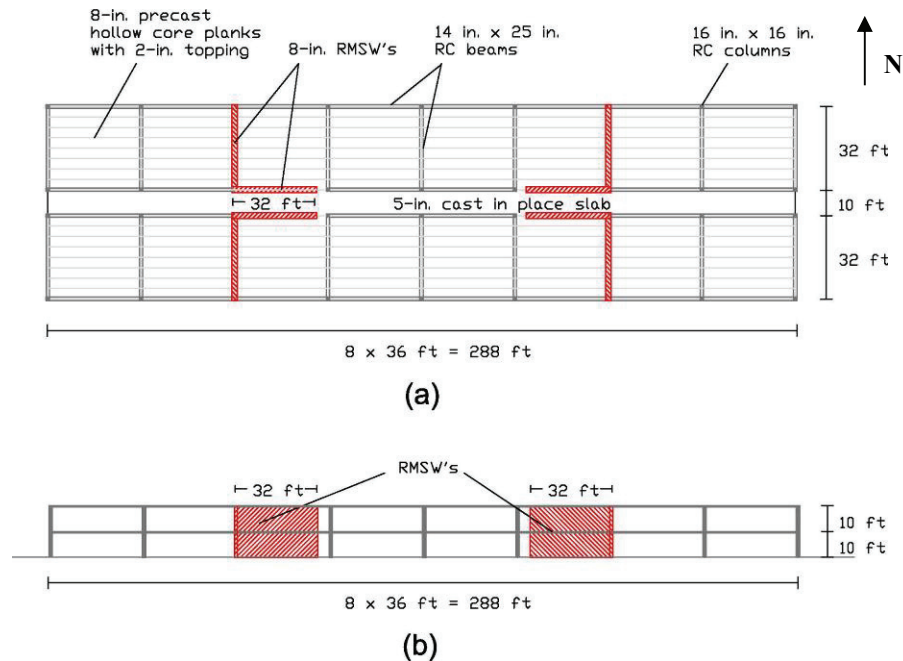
Two-story building; (a) plan view; (b) elevation view
